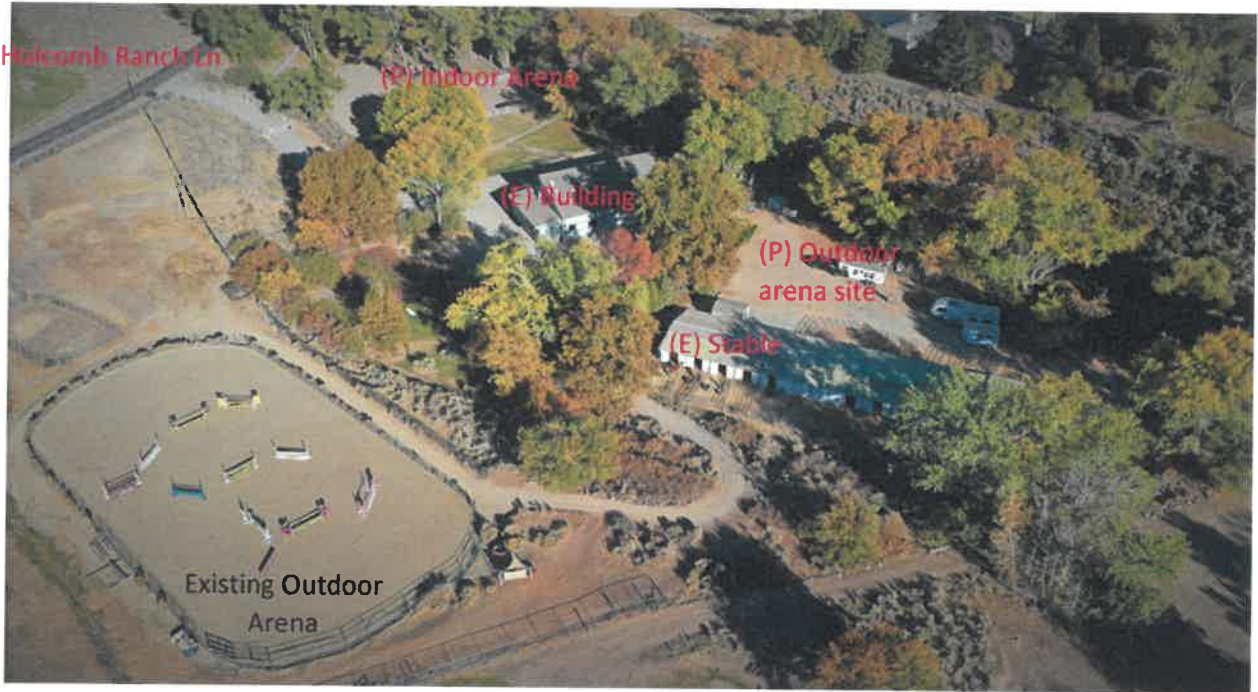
Layout of existing site showing where new buildings and layouts will go.
